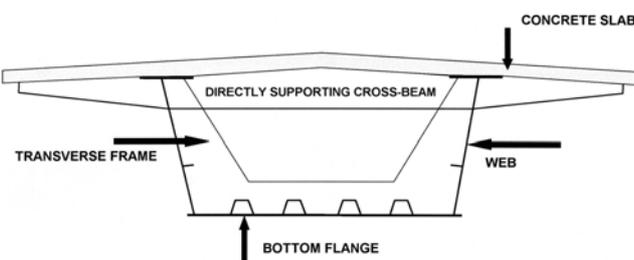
Box girder with directly supporting cross-beams and cantilevers (pavement bidirectional banking)
